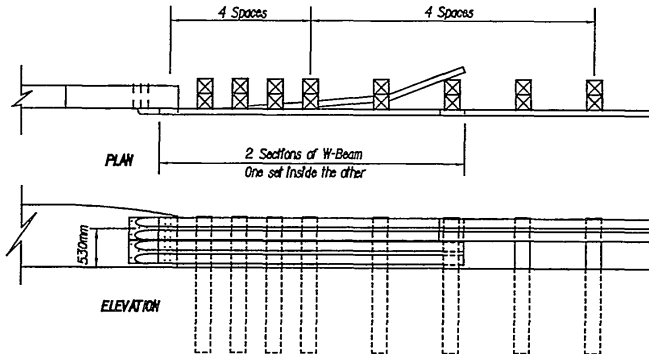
Vertical Concrete Bridge Railing with W-Beam Approach Rail/Rubrail
